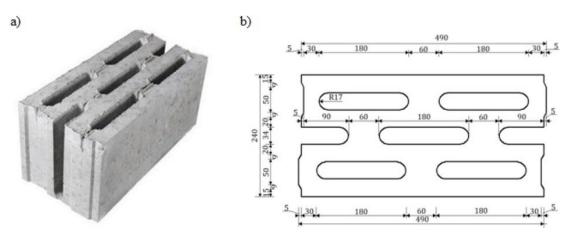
Concrete block Alfa: a) view, b) dimensioned horizontal cross-section
